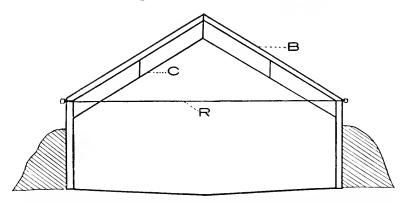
Cross-section of a cement and corrugated-iron mushroom house, banked up with earth. The house is provided with a truss roof. *C*, corrugated iron; *B*, wooden truss; *R*, half-inch iron tie rod. The house is fifteen feet wide and four feet high at ends to iron roof, and is heated from boiler.
